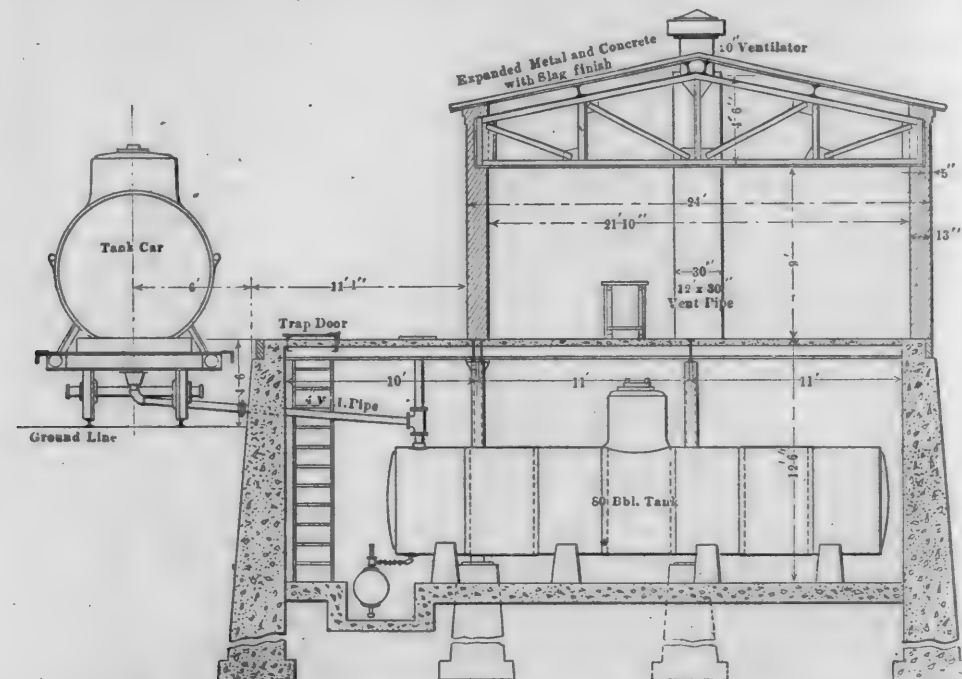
CROSS-SECTION THROUGH OIL HOUSE.
